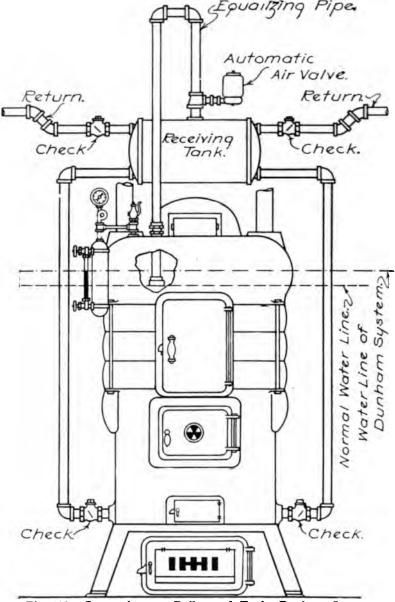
Connections to Boiler and Tank—Dunham System.
